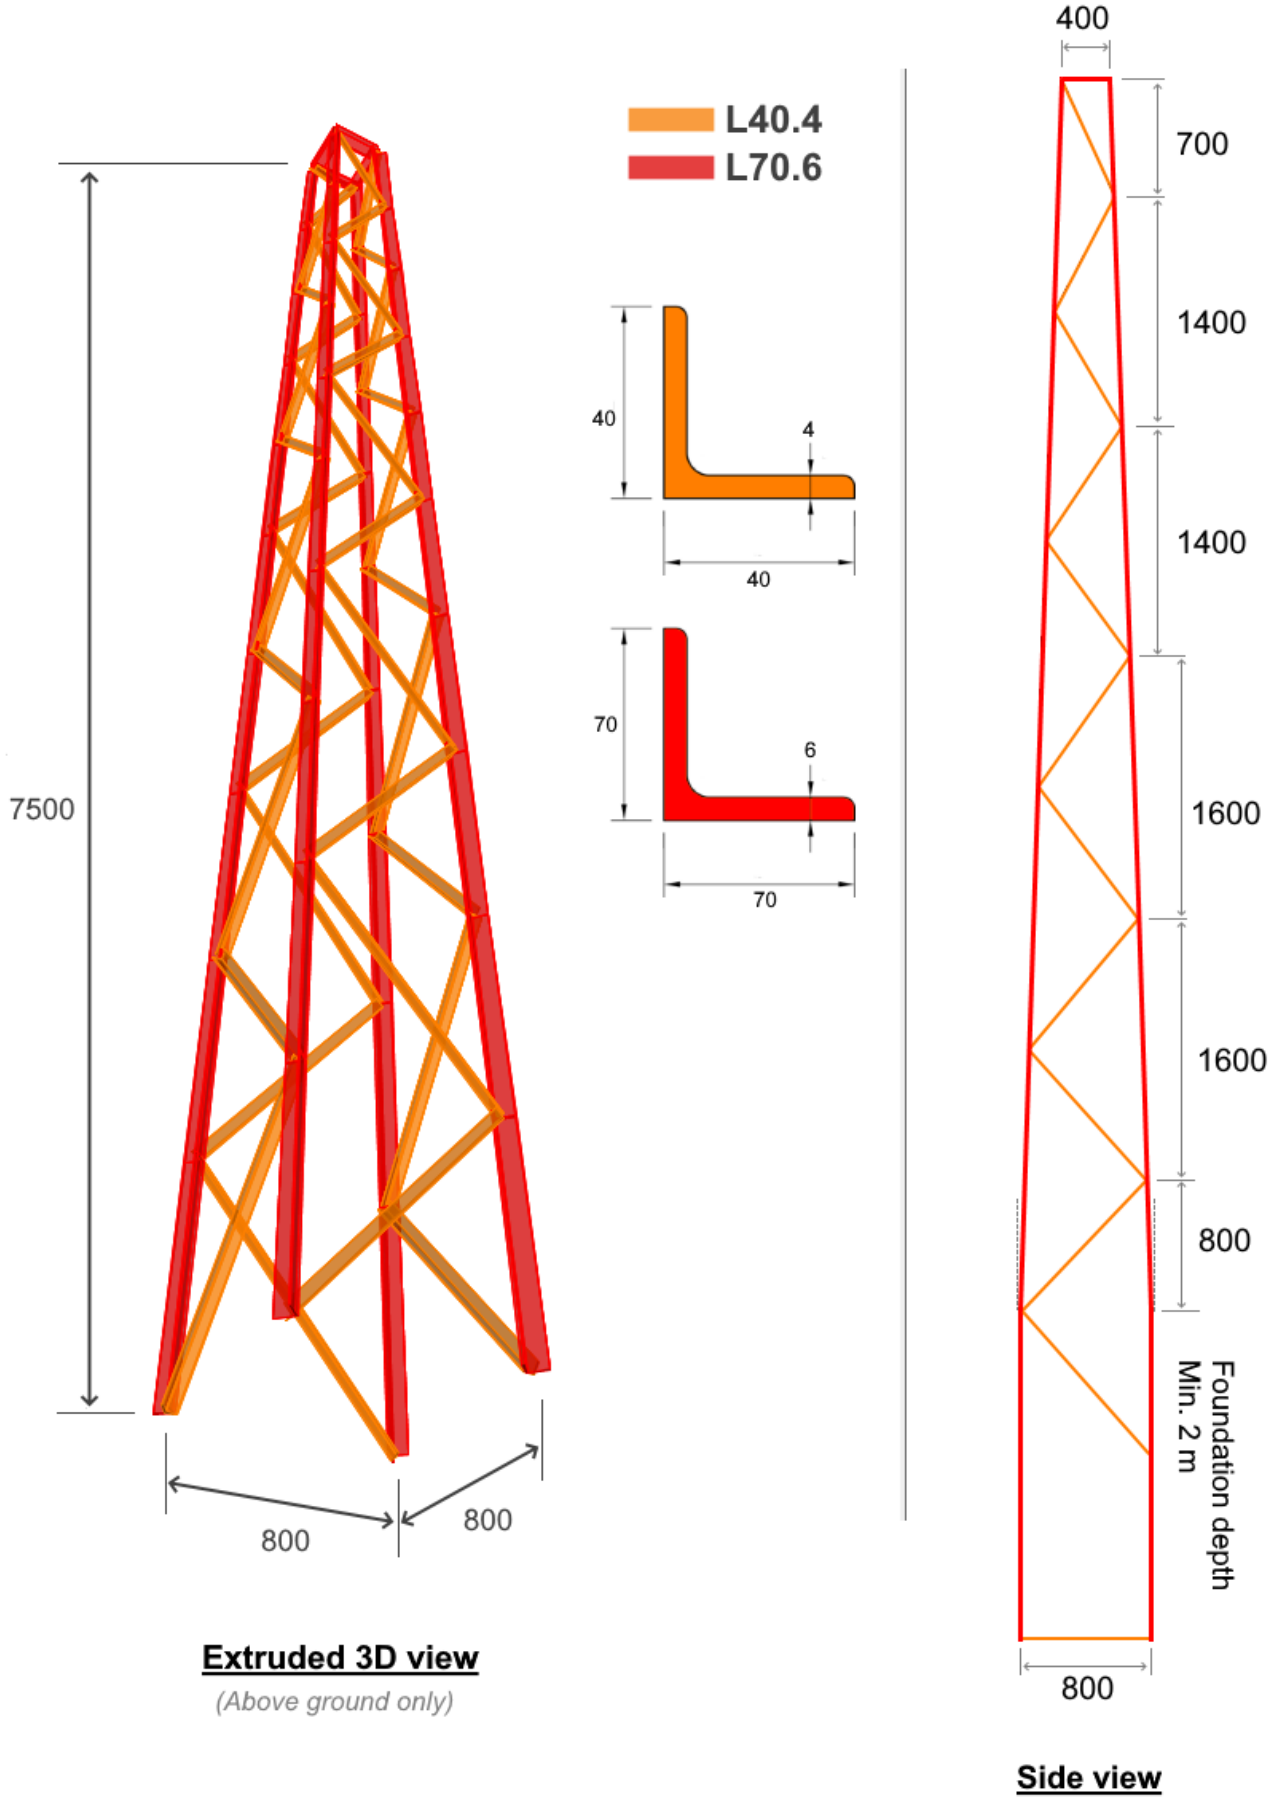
Steel lattice tower details. Steel grade S275 or higher.
